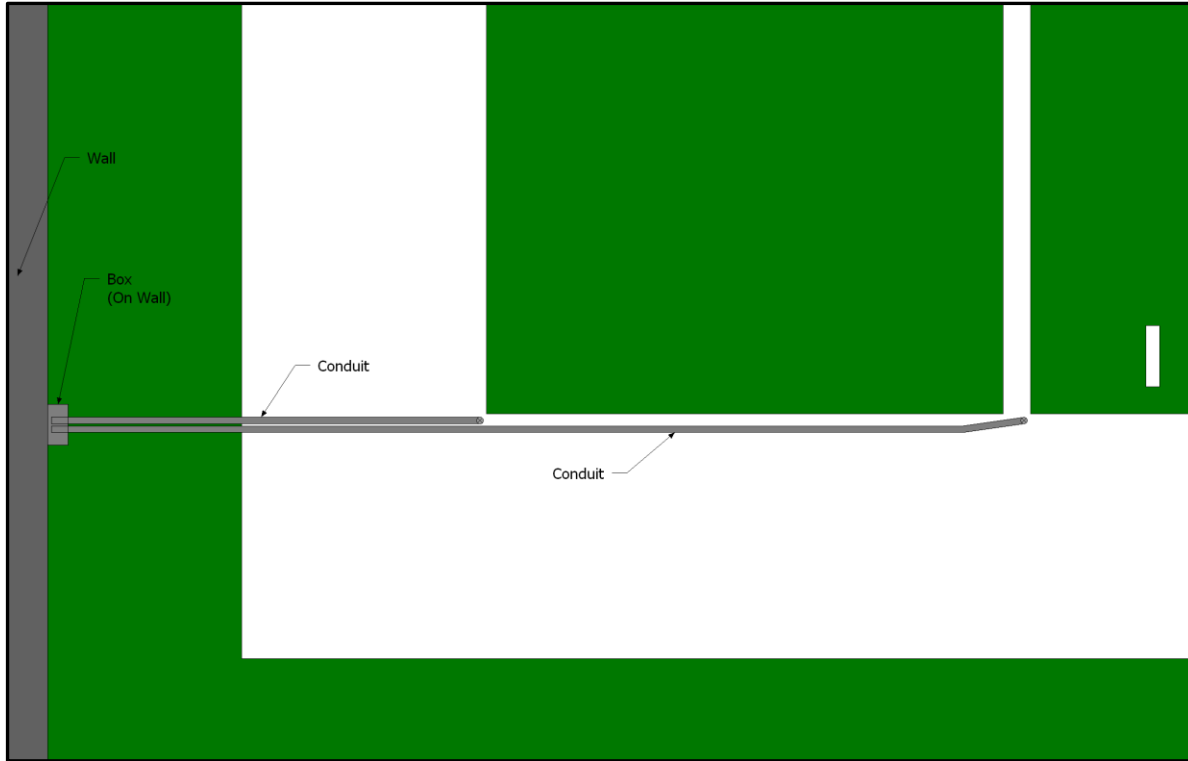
Example conduit layout and box location. End zone length and distance between pylon locations are not shown to scale.
